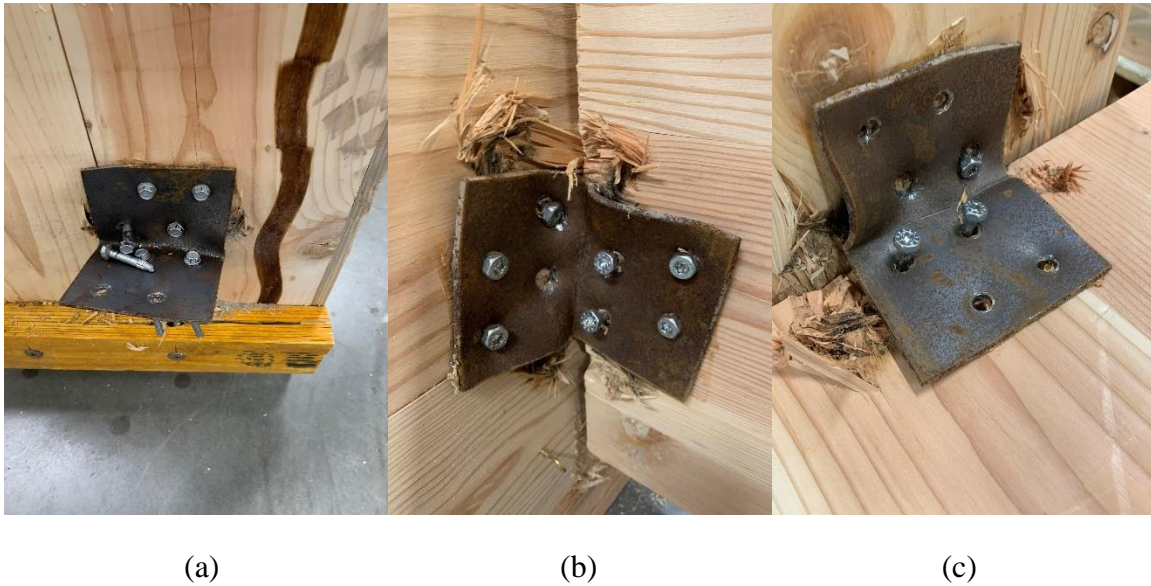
Load-Bearing Wall-to-Floor Cyclic Test Failure
